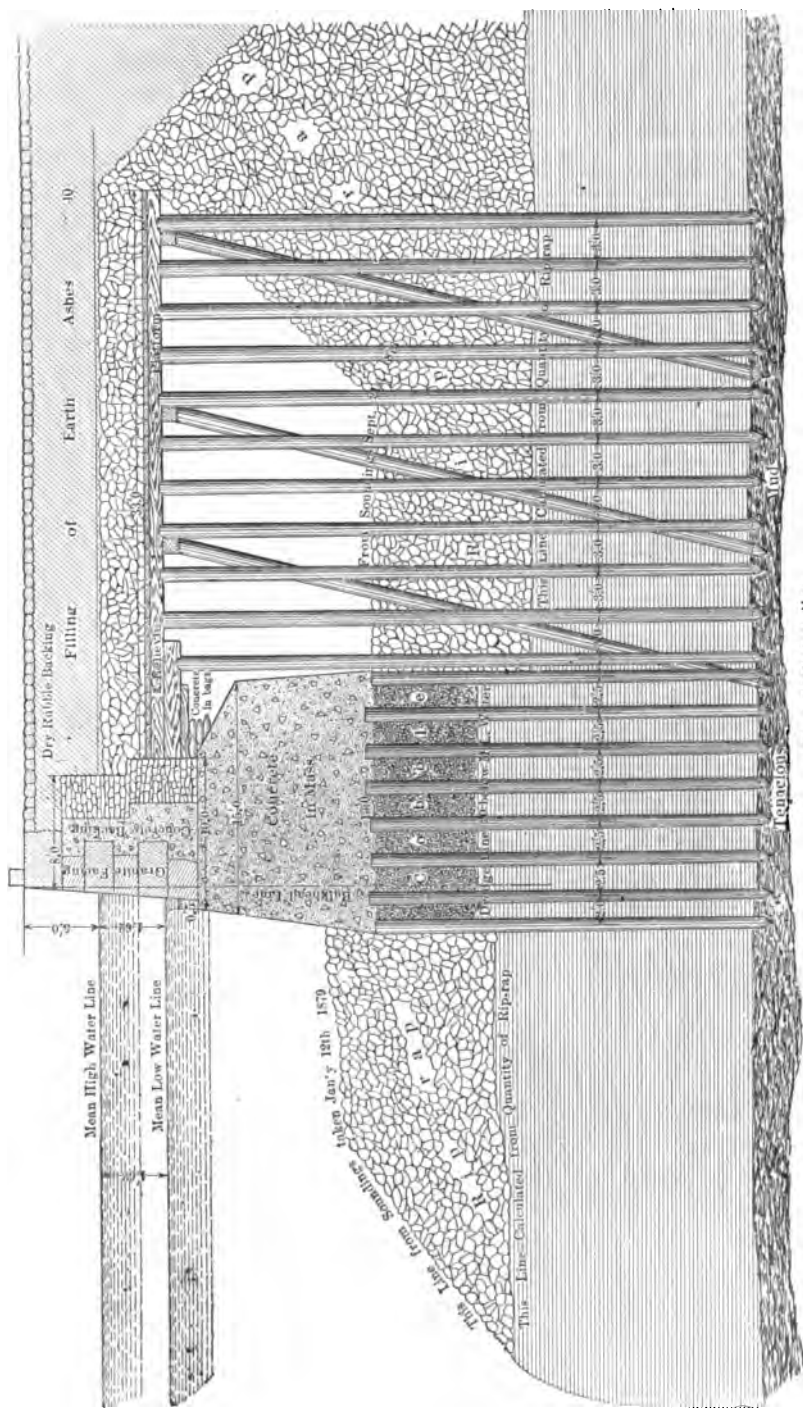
NEW YORK SEA WALL RELIEVING PLATFORM.
